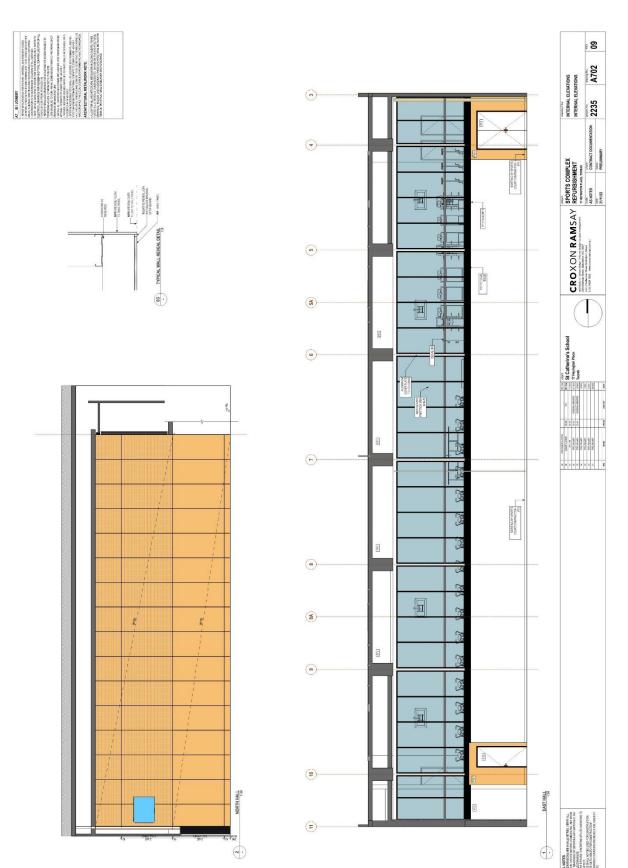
Dorothy Pizzey Centre – Internal Elevations 1
